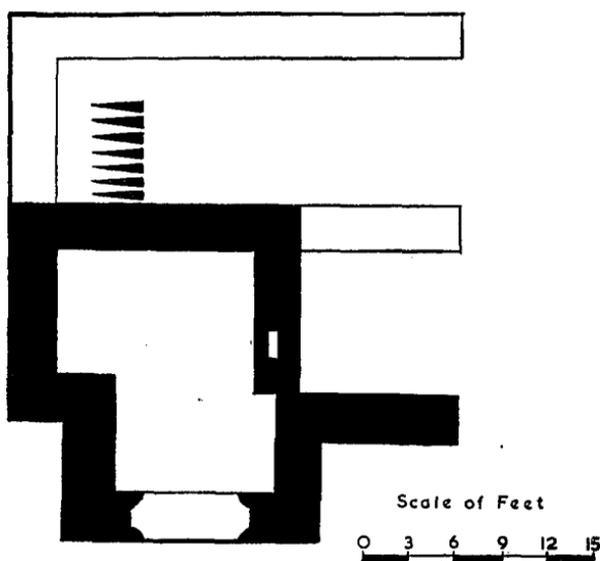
Conjectural reconstruction of the ground plan of the building in eight acres
